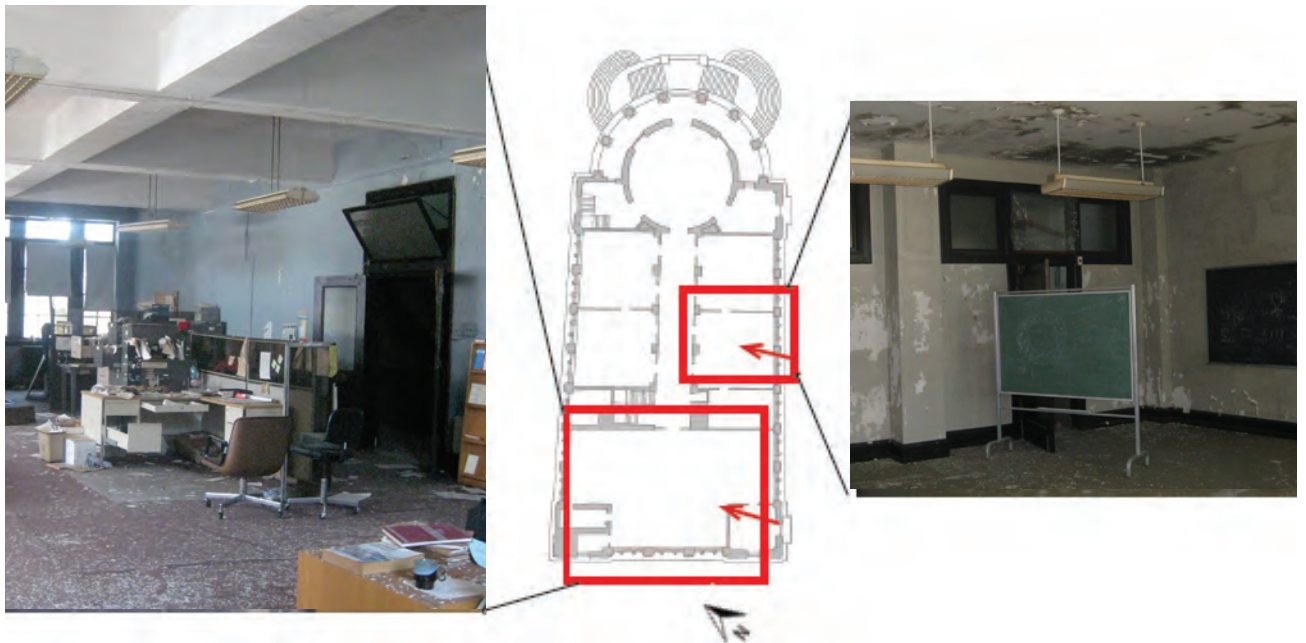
First floor office space, Source: Germantown Town Hall Studio 2011
